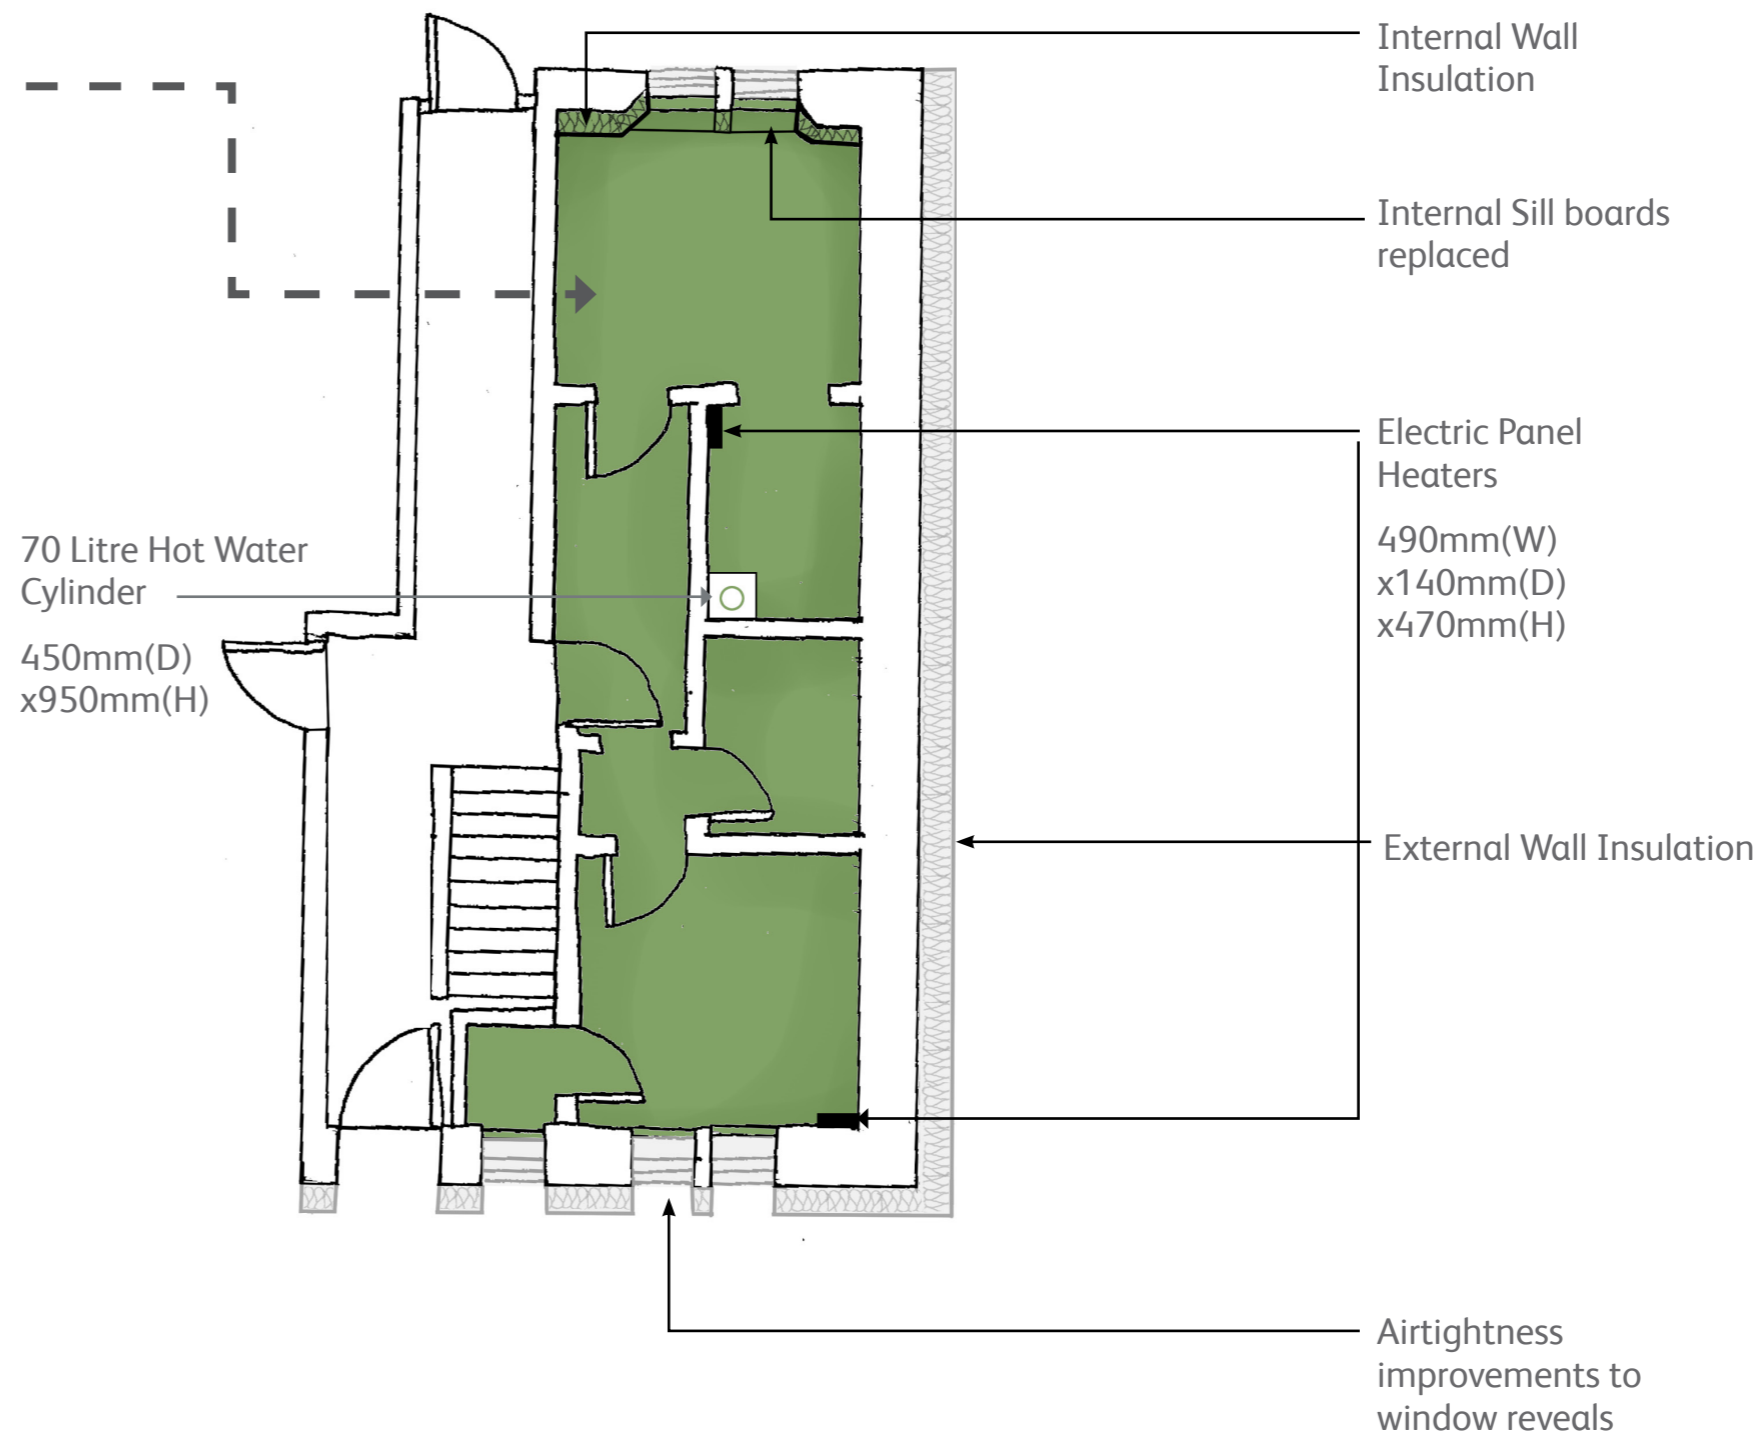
Floor Plan of typical ground floor flat showing works done within flats when void.
